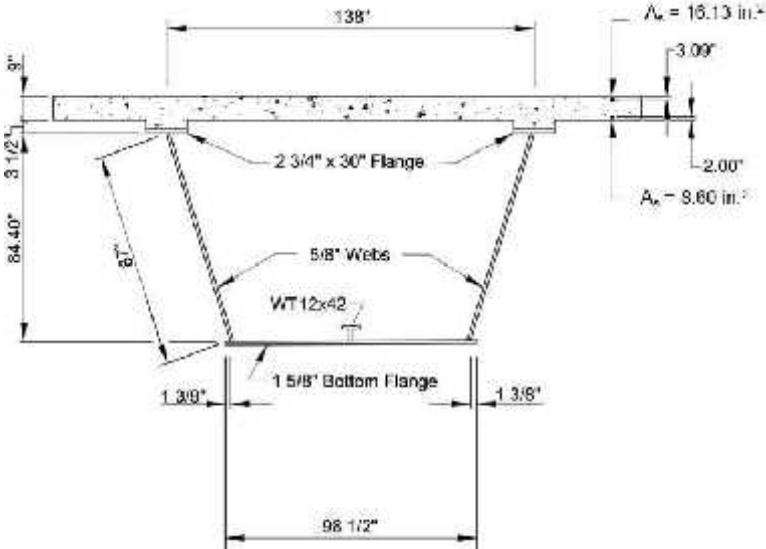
Cross sectional dimensions of the weathering steel box girder bridge (FHWA 2012)
